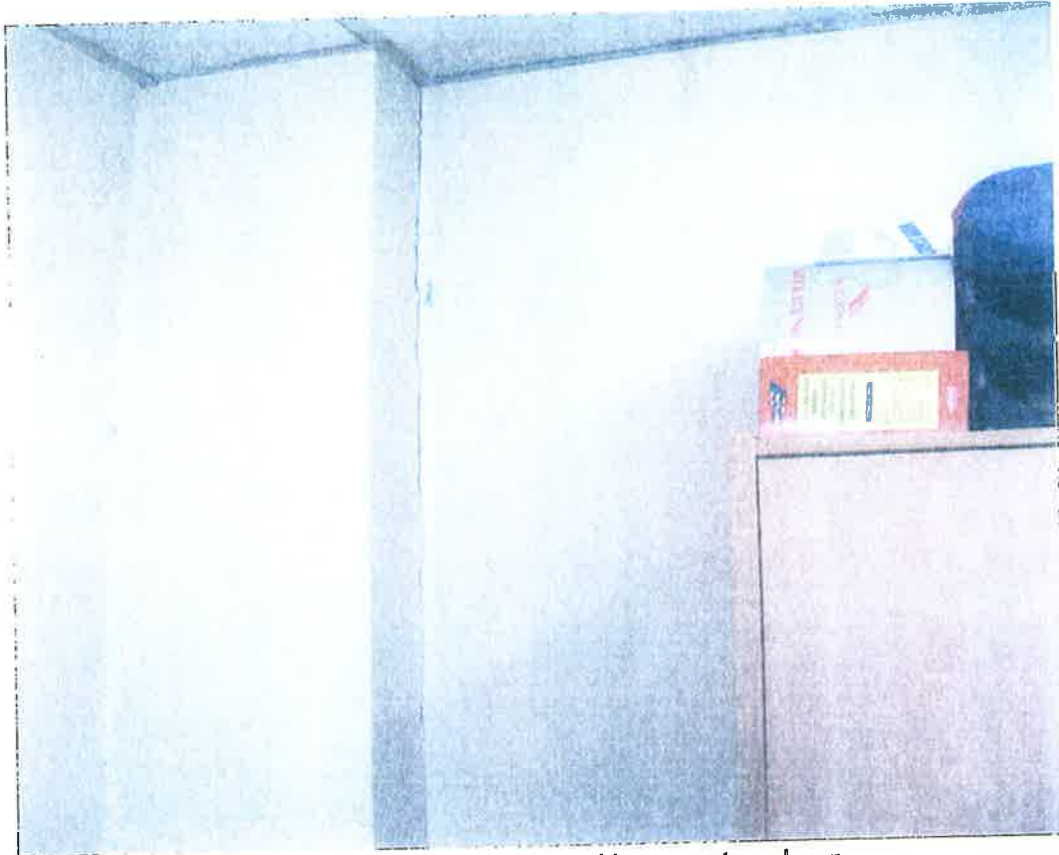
Partition lining damaged at junction with concrete column.
